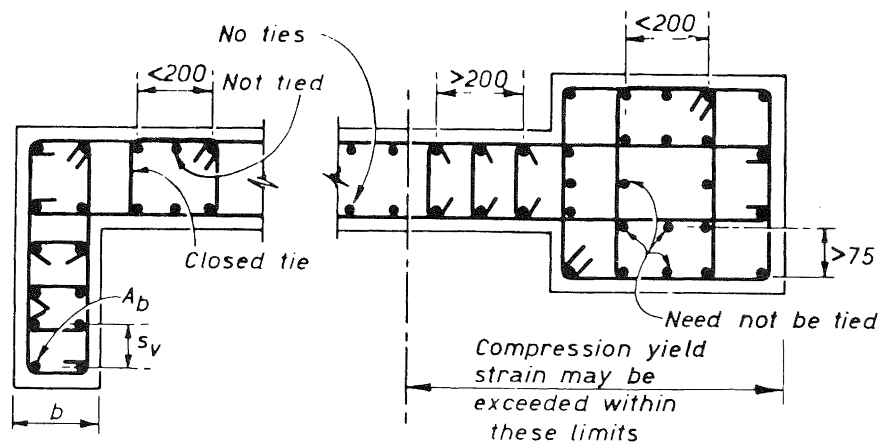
Transverse Reinforcement in Potential Yield Zones of Shear Wall Sections.
